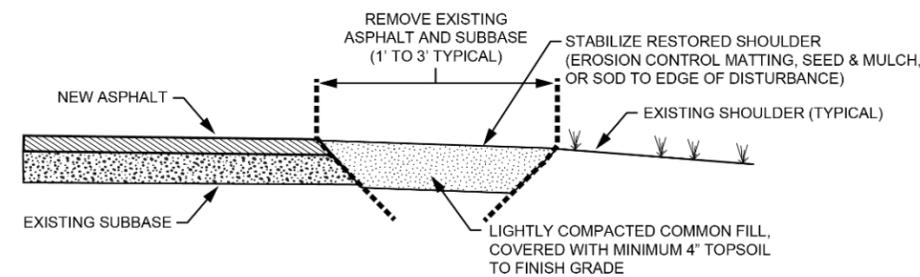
SHOULDER RESTORATION, MODERATELY SLOPING ROADWAY AND SHOULDER, AFTER ROADWAY NARROWING AND REPAVING (TYPICAL)
